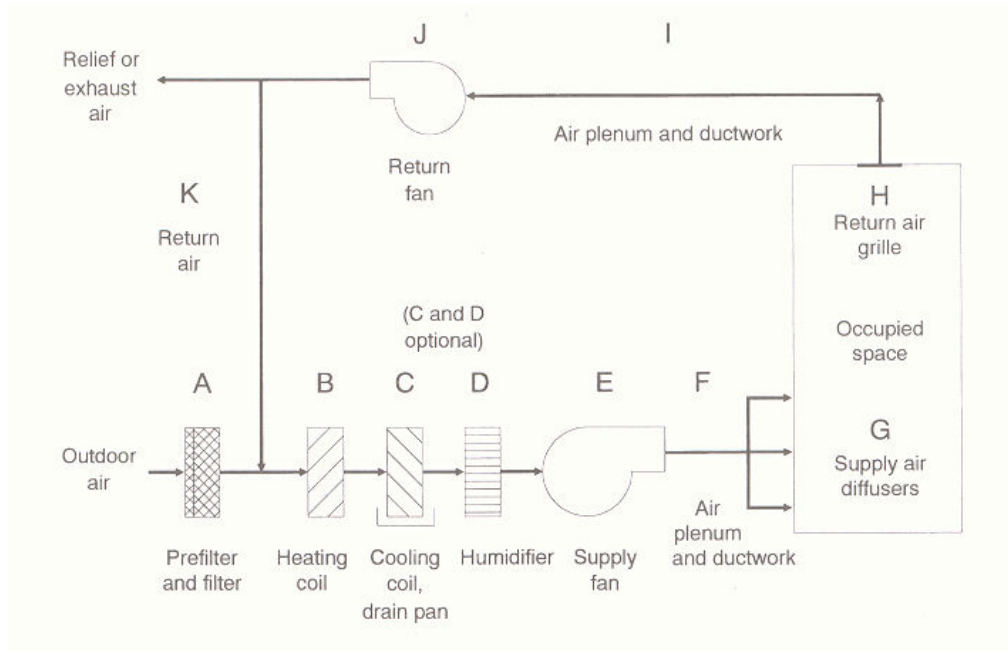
Typical Air Handling Unit(Heating, Ventilating, Air-conditioning, HVAC) in Building.
